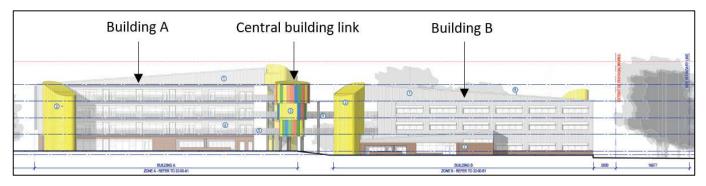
| West elevation (Base source: Applicant's EIS 2023)
